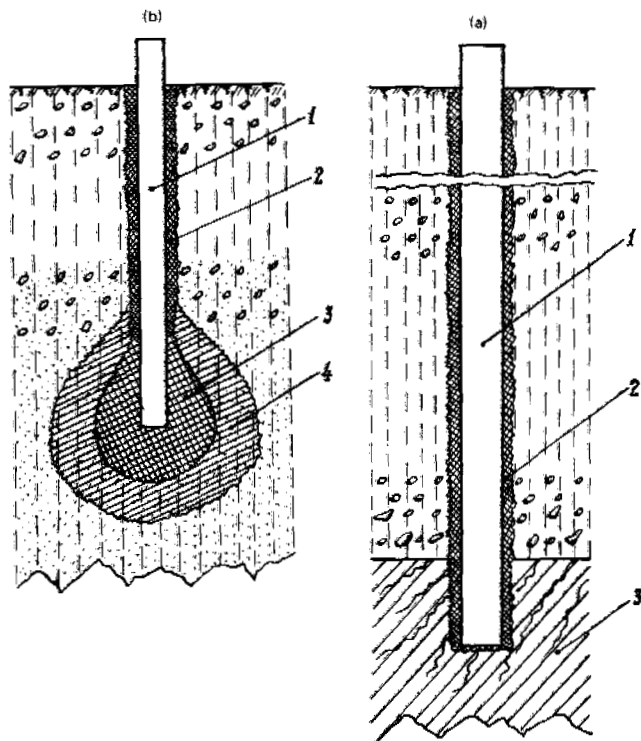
Types of grouted pile foundations. (a) Frozen-in pile; 1--reinforced concrete drilled pile; 2--grouted concrete bonding; 3--supporting bed (fissured bedrock). (b) Thermally expanded pile; 1--reinforced concrete drilled pile; 2--concrete bonding; 3--expanded base; 4--bearing ground strengthened by injection.
